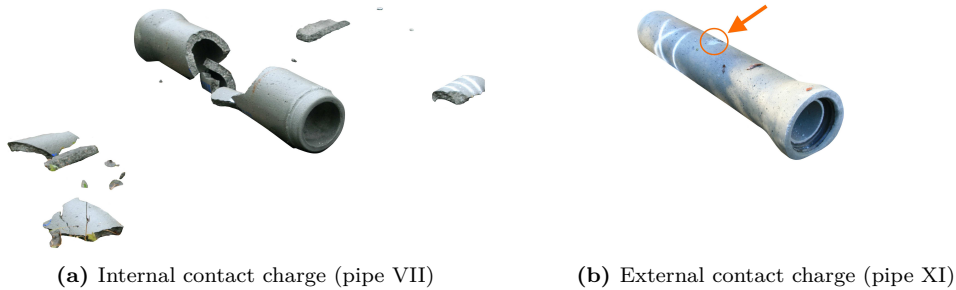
Damage of two the smaller plain concrete pipes with contact charges of 10 g C4.
